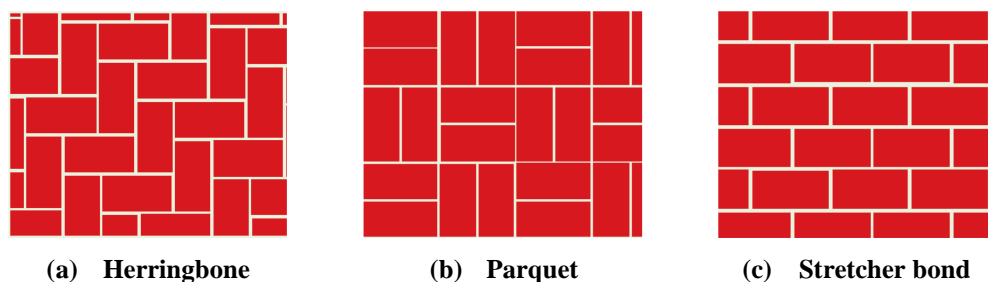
Typical paver laying patterns (CMAA, 2010)
